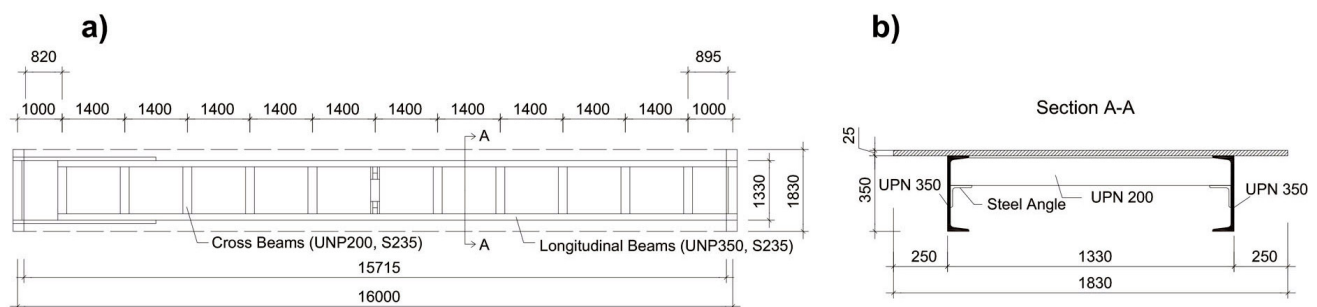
(a) Elevation and (b) cross-section of the laboratory footbridge structure (7).
